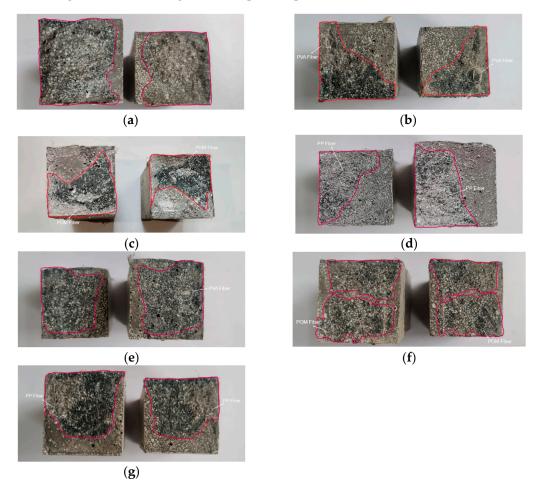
Fracture surface of repaired specimens: (a) B0; (b) B1; (c) B2; (d) B3; (e) B4; (f) B5; (g) B6.
